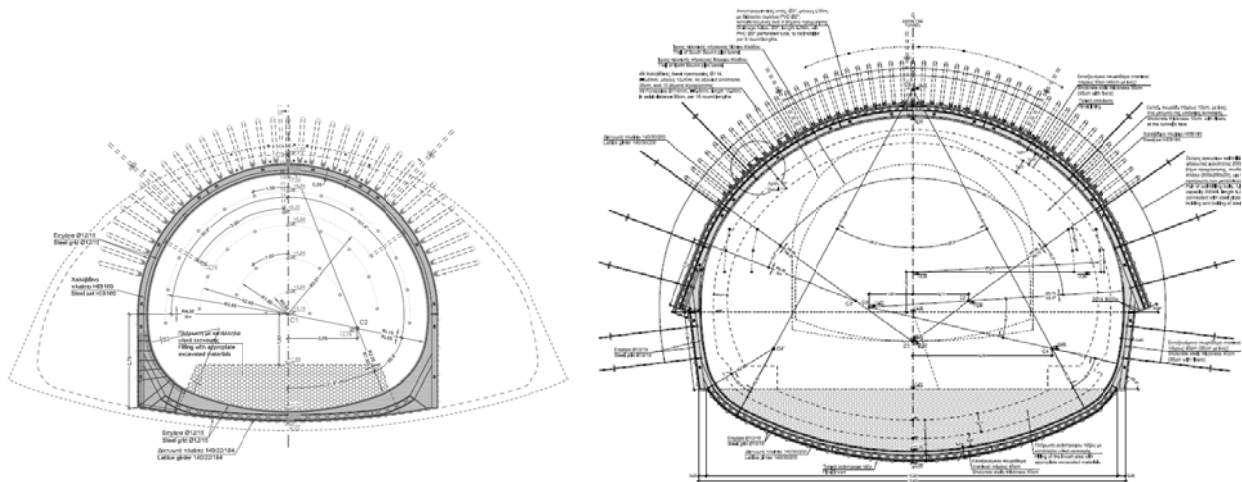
Tunnel T3 – Rehabilitation sections at ch.12+400 – a. pilot tunnel phase; b. widening phase
